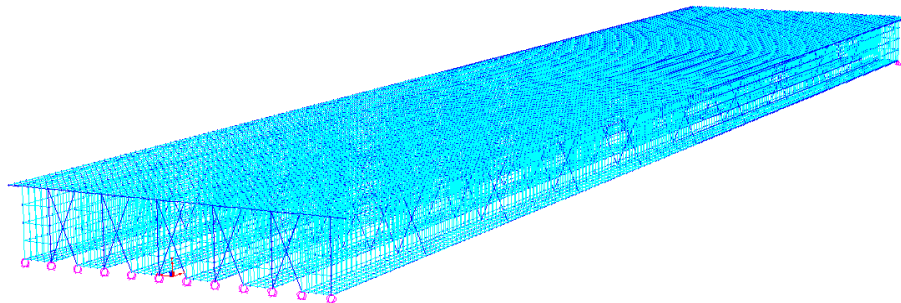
SAP2000 model view for composite multi-box girder X-bracing
